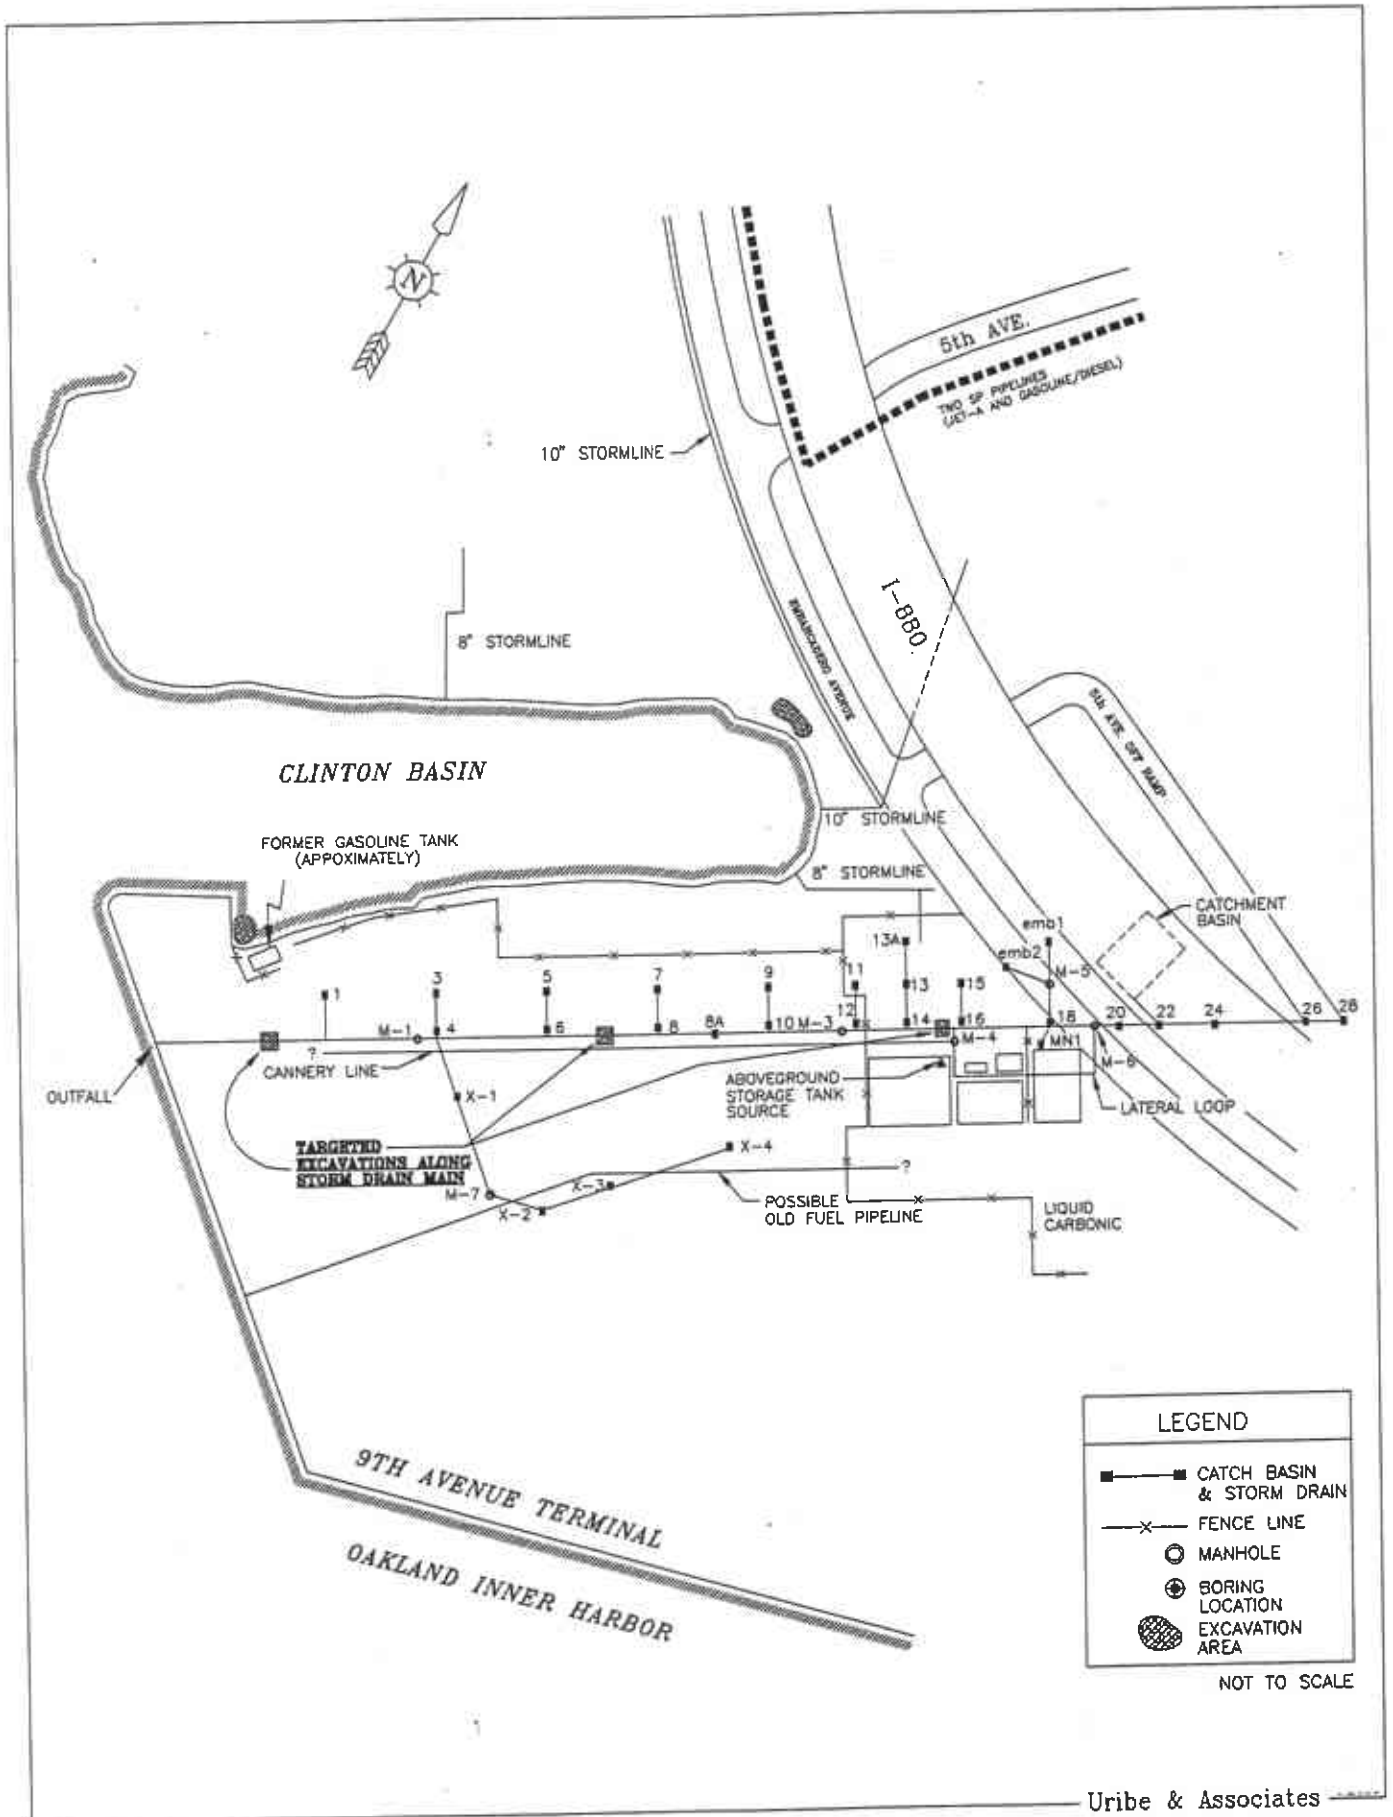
Planned Excavation Locations Along Storm Drain Main
